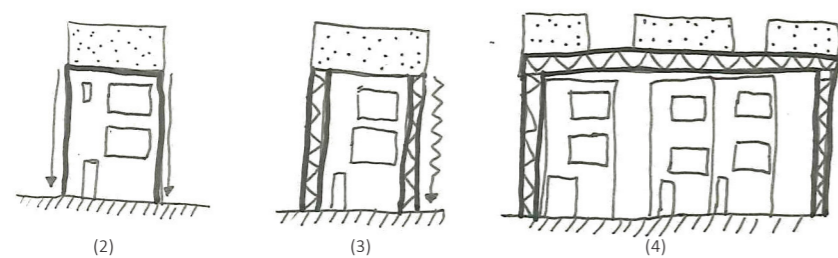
| A schematic drawing of the options of direct densification. It depends on the strength of the construction of the current building. For example docking buildings are often heavy constructed, so new structures can be built on top of them without adding external construction.
